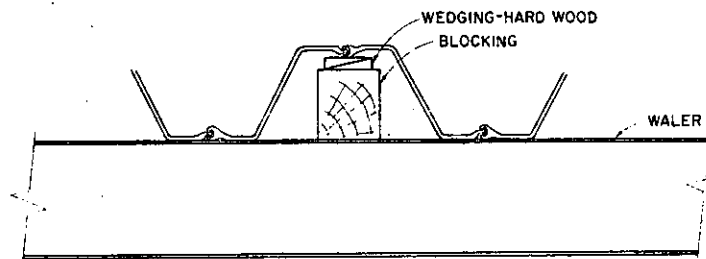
BACKING OF STEEL SHEET PILING TO PREVENT DISTORTION
